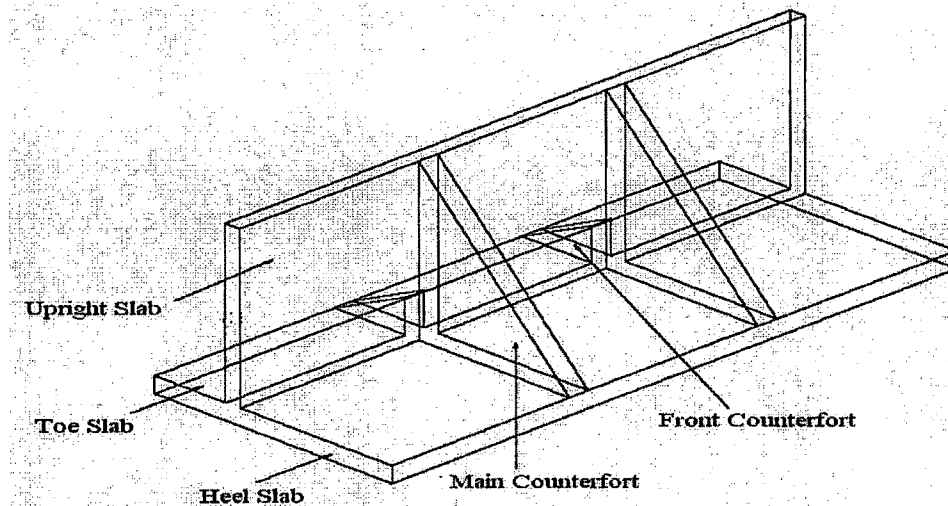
Perspective View of Counterfort Retaining Wall
